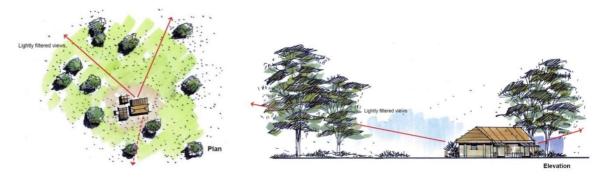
Typology 1 – Minimally screened. Typical plan and elevation.
